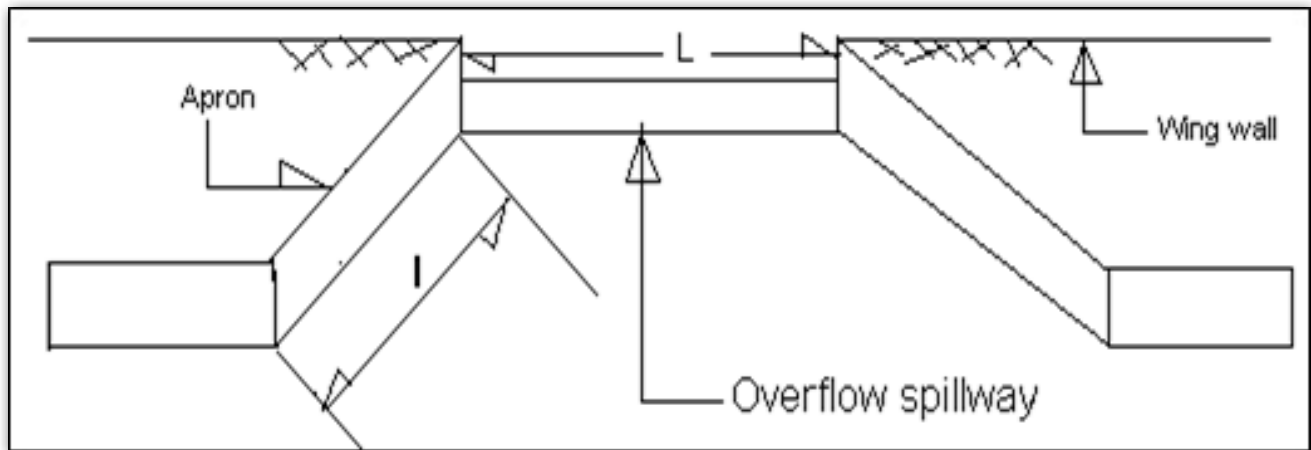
Front view of an overflow masonry storage/diversion dam
